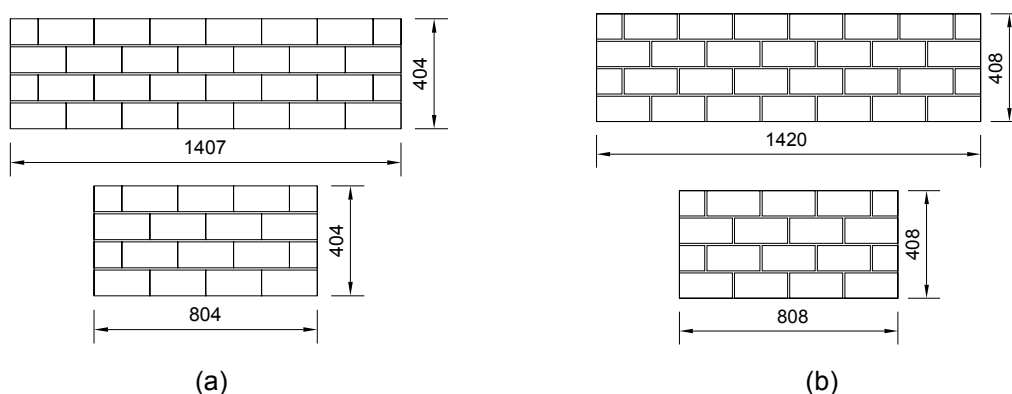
Geometry of masonry beams: (a) masonry beams built with 3C-units and (b) masonry beams built with 2C-units (dimensions in mm).
